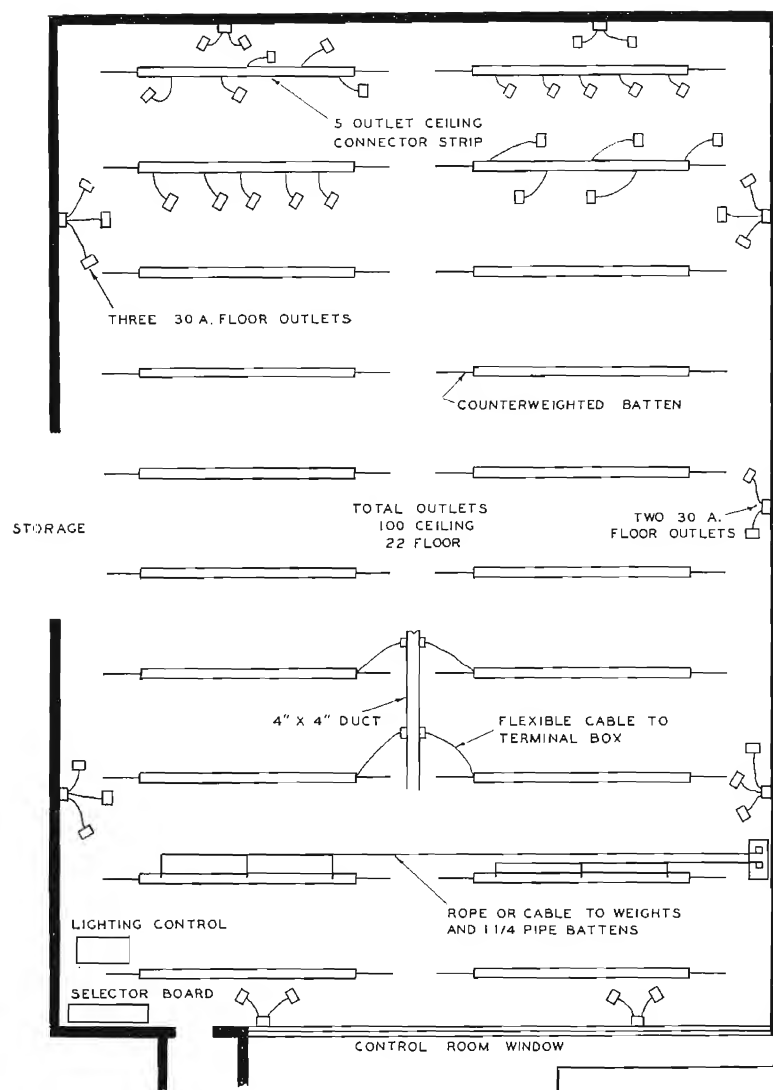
Studio #1 lighting plan for the "C" Station. The lighting for Studio #2 is similar to that of the Plan "B" Station. (See Fig. 44.)
